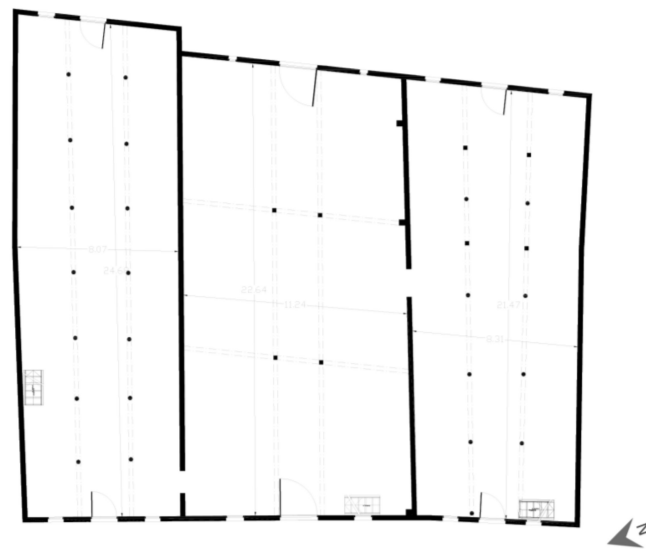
Plan of the 3rd floor of the case-study building, with the position of the structural elements.
